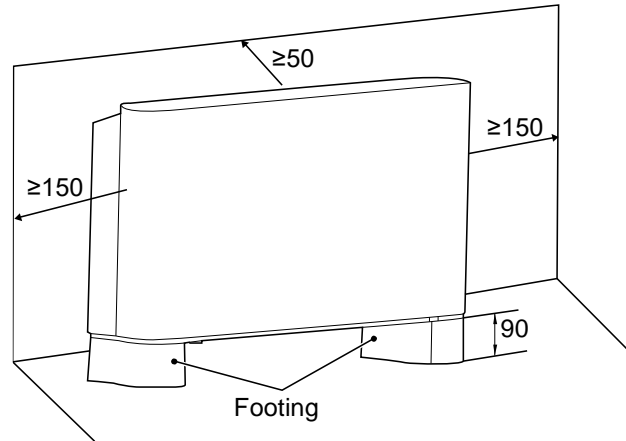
F4 series (air inlet from front) Exposed Floor Standing space requirements (unit: mm)
